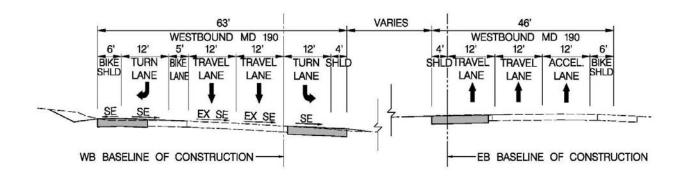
Alternative 2 - MD 190 Intersection East of Pyle Road
